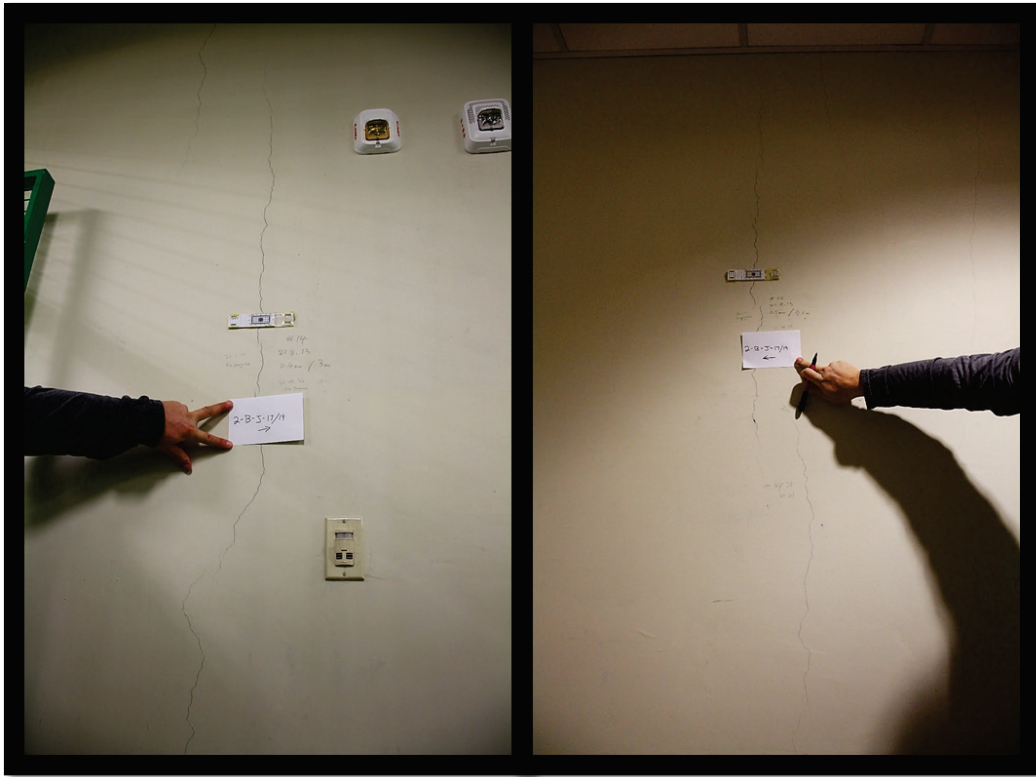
Wall cracks with gauges in Tower 2 basement.
